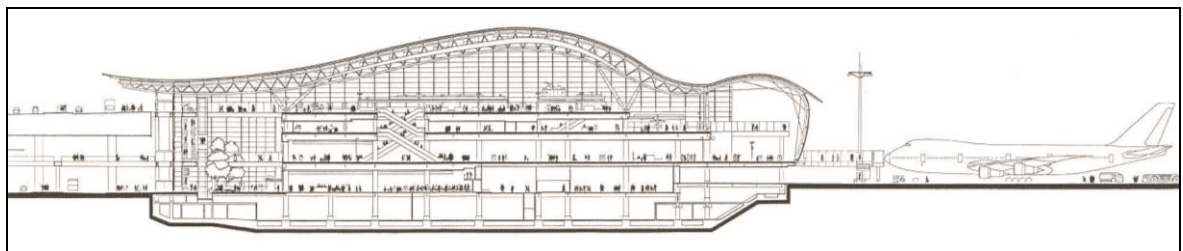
Section of the terminal building. Source: (Kansai, 2019)
